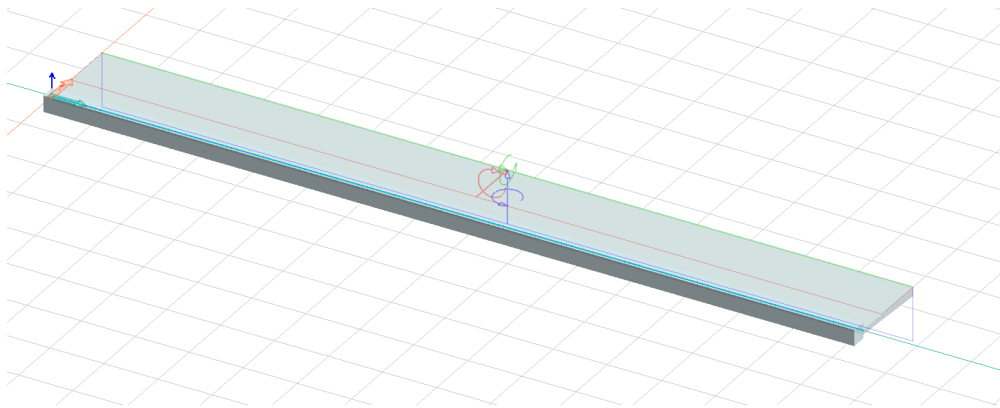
Cantilever slab with edge beam subjected to point load, Adopted from Statens Betongkommitté (1968).
